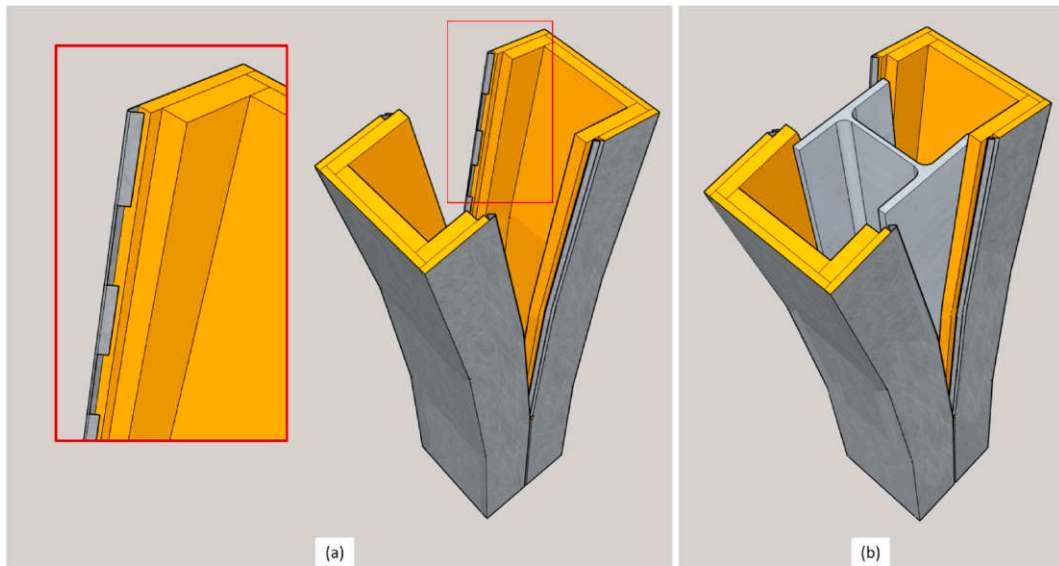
Installation concept: a) Discontinuity of the male claws; b) Connection of two half protections around a steel profile.
